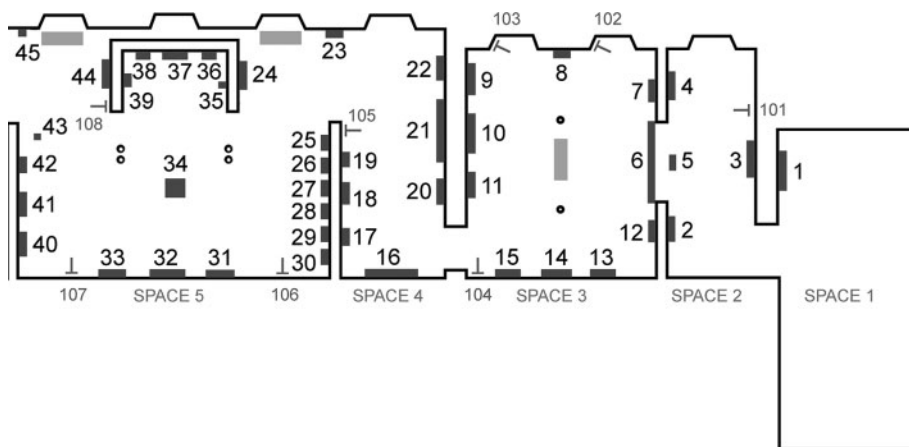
Floor plan of the ground floor, exhibition Spaces 1–5.
